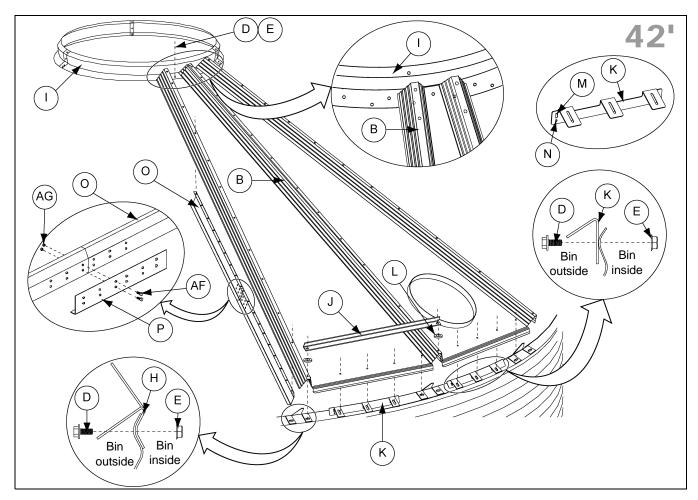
L Roof Panel Assembly (42' Diameter Bin)
